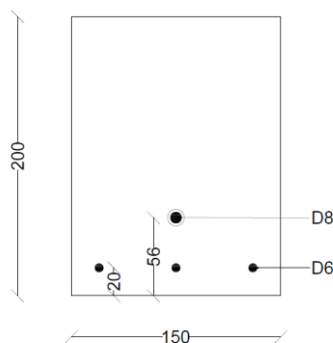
Cross-section of the considered post-tensioned beam (dimensions in mm)
